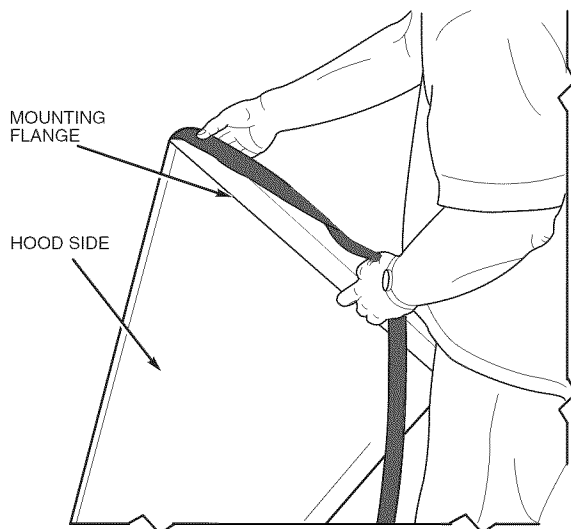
Adding Seal Strip to Sides of Hood Top Mounting Flange
